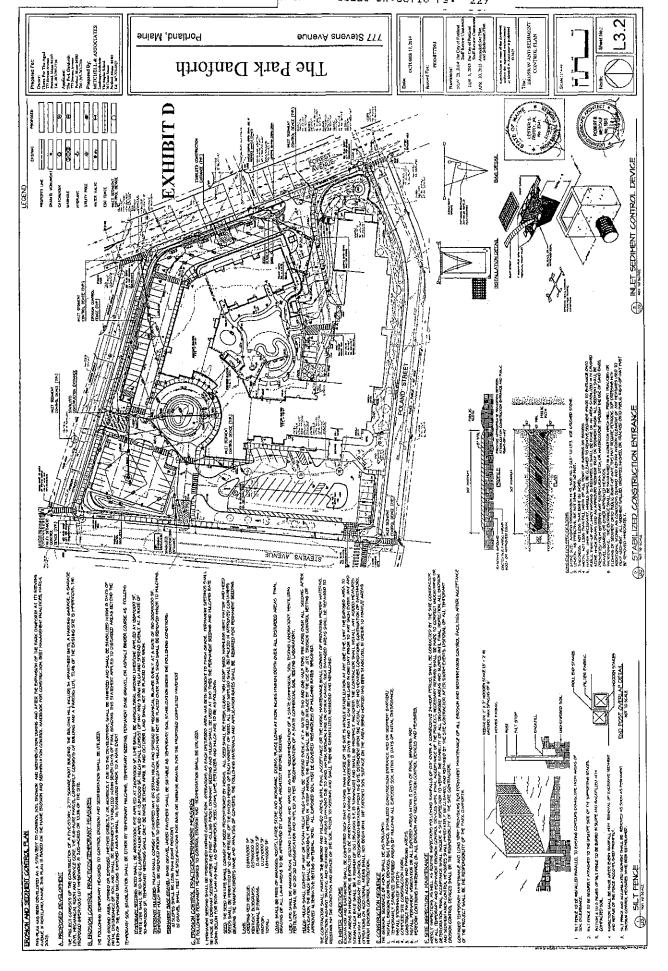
Exhibit D: Approved Erosion and Sediment Control Plan L3.2
